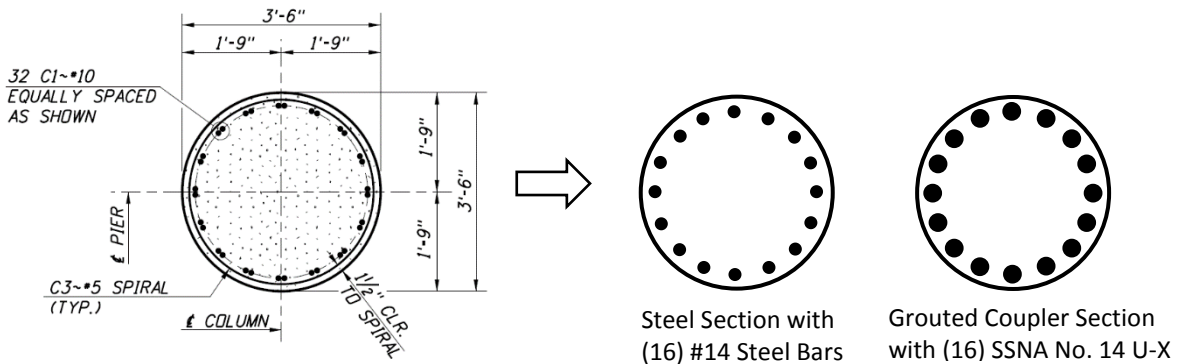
Parma Bridge Column Steel and Grouted Coupler Sections (NTS)
